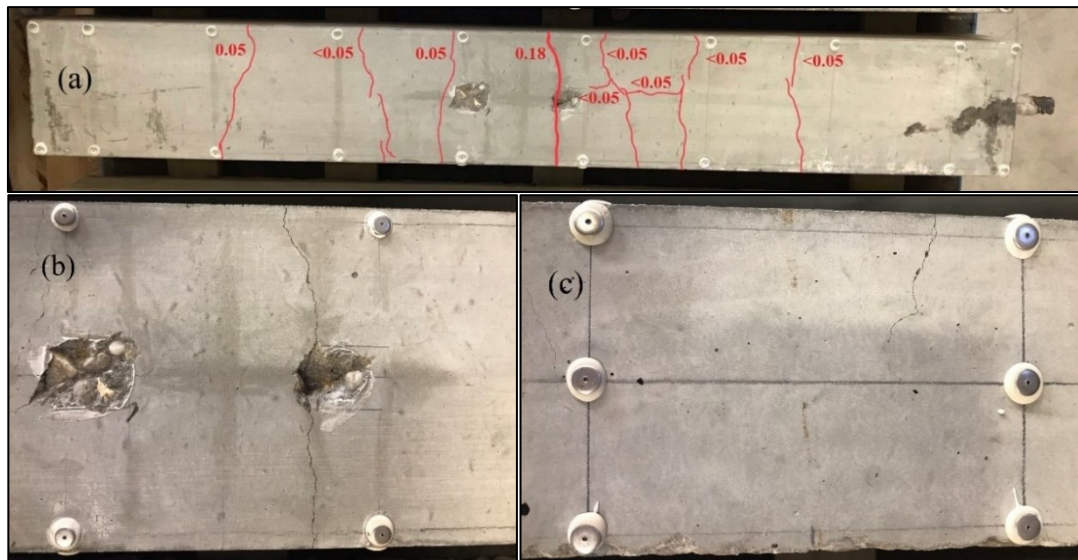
C2 cracks configuration: (a) Mapping, (b) Main crack top view, (c) Main crack lateral view
